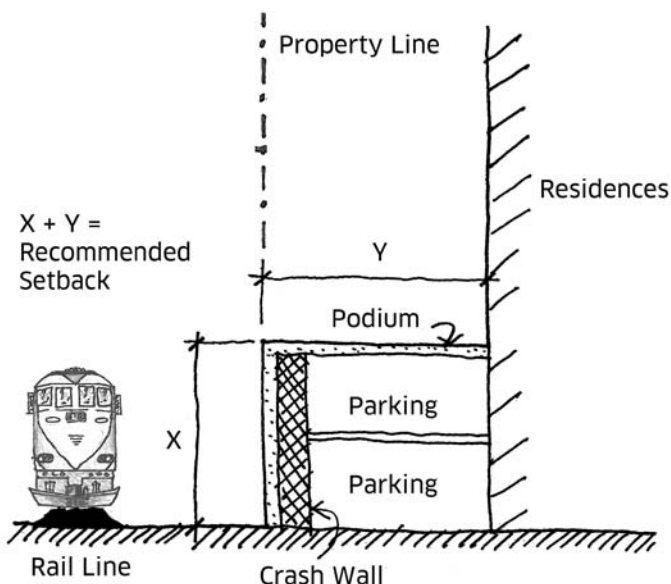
// INCORPORATING A CRASH WALL INTO A DEVELOPMENT CAN REDUCE THE RECOMMENDED SETBACK.
